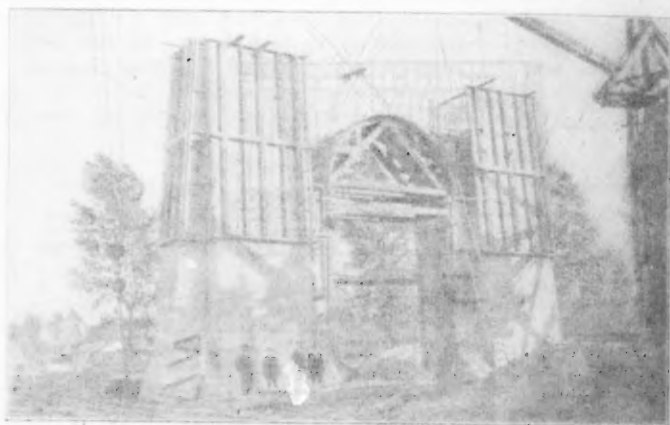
GENERAL ARRANGEMENT OF CONCRETE FORM, HAWAIIAN ISLANDS.
